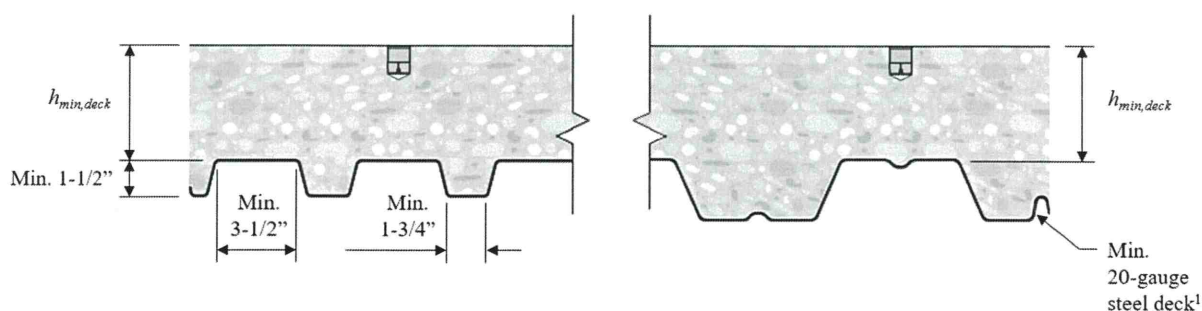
C – HDI-TZ IN THE TOP OF CONCRETE FILLED PROFILE STEEL DECK ASSEMBLIES
